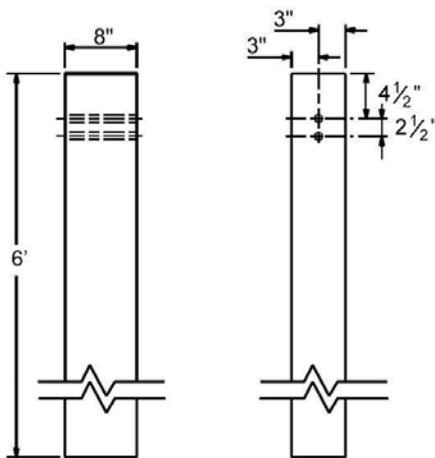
Adjustable Height Guardrail (2 Hole Post)
